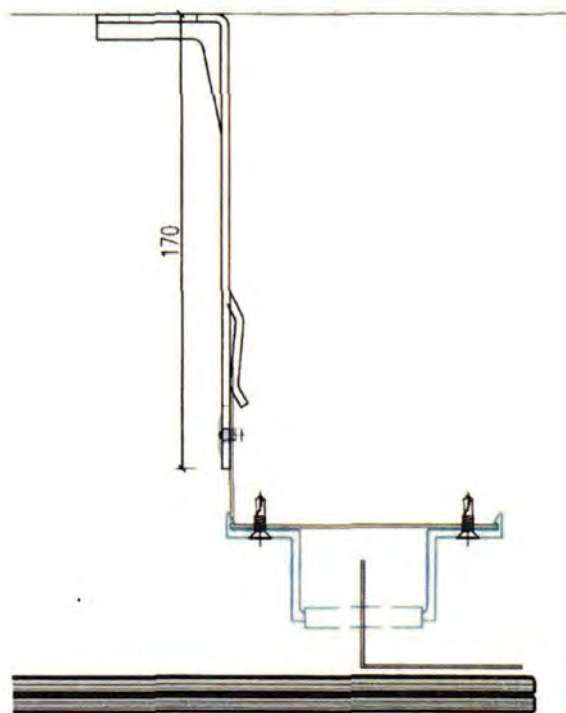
Details of test elements – details: gluing of a frameless photovoltaic module to the steel structure with anti-corrosion ZM coating.
